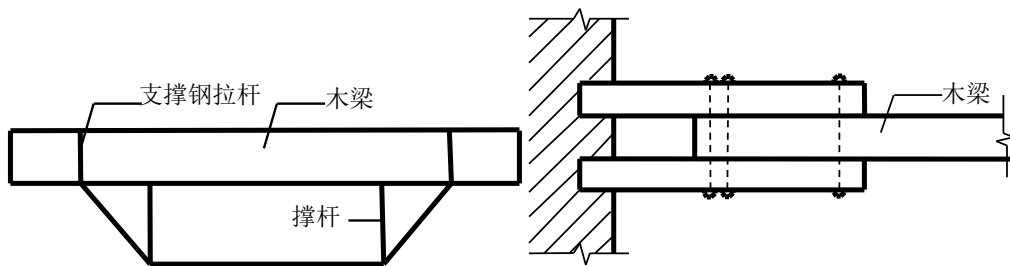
Reinforcement of strut-framed steel rod (left) and clip (right)
